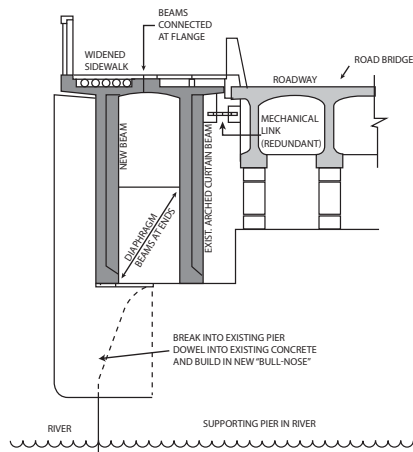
Widened sidewalk as done on the western edge of the bridge
